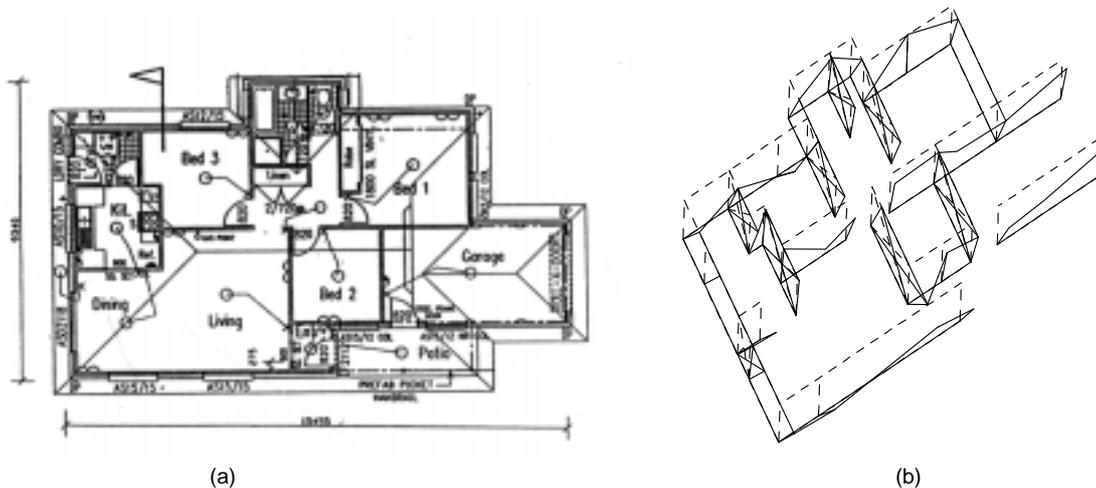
The Jabaru floor plan and a snap shot of the animated sway mode shape
